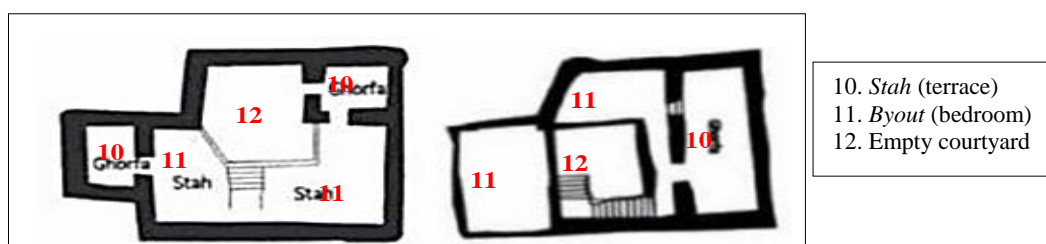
Floor plan of a traditional dwelling in Nezla (Touggourt)
